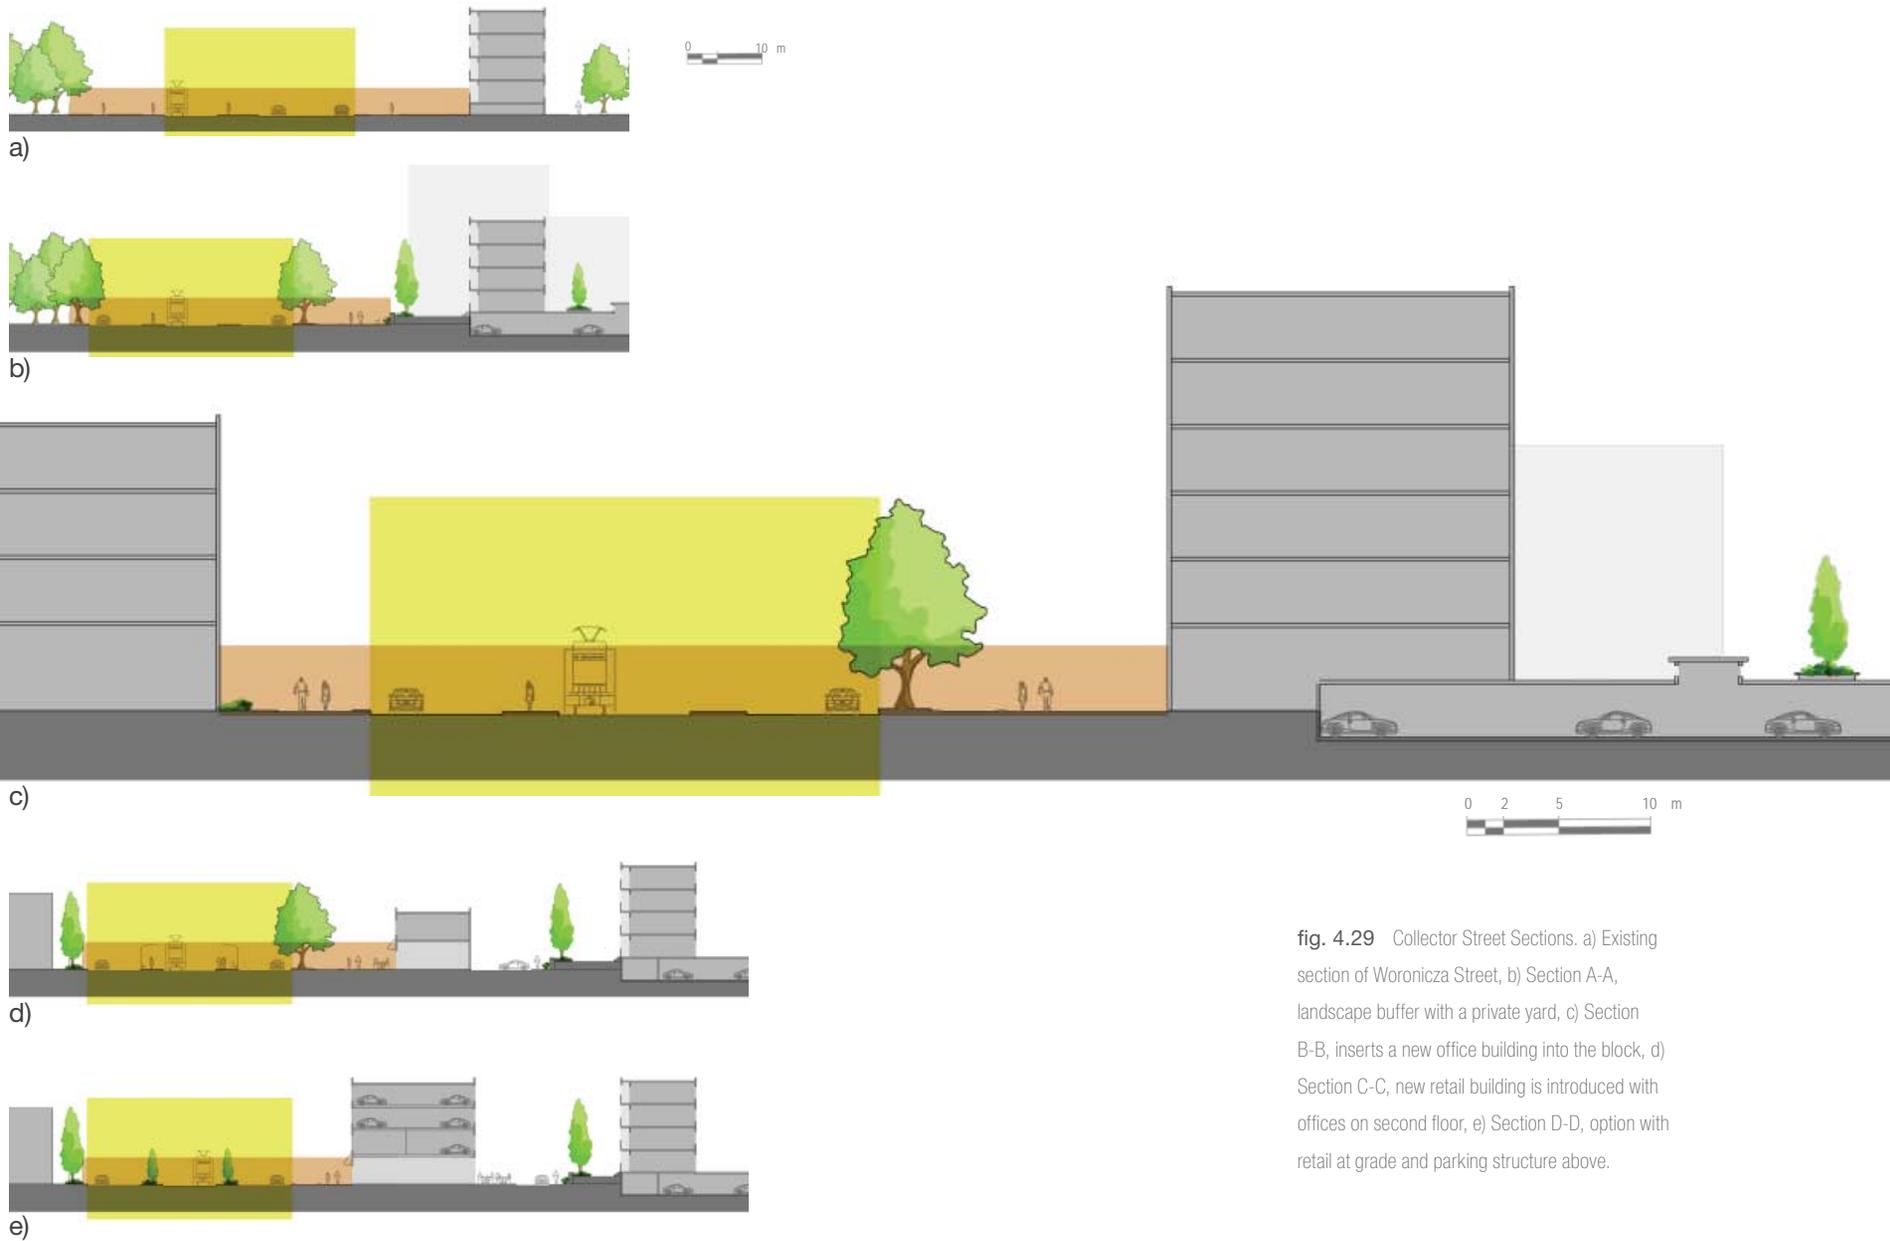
Collector Street Sections. a) Existing section of Woronicza Street, b) Section A-A, landscape buffer with a private yard, c) Section B-B, inserts a new office building into the block, d) Section C-C, new retail building is introduced with offices on second floor, e) Section D-D, option with retail at grade and parking structure above.
